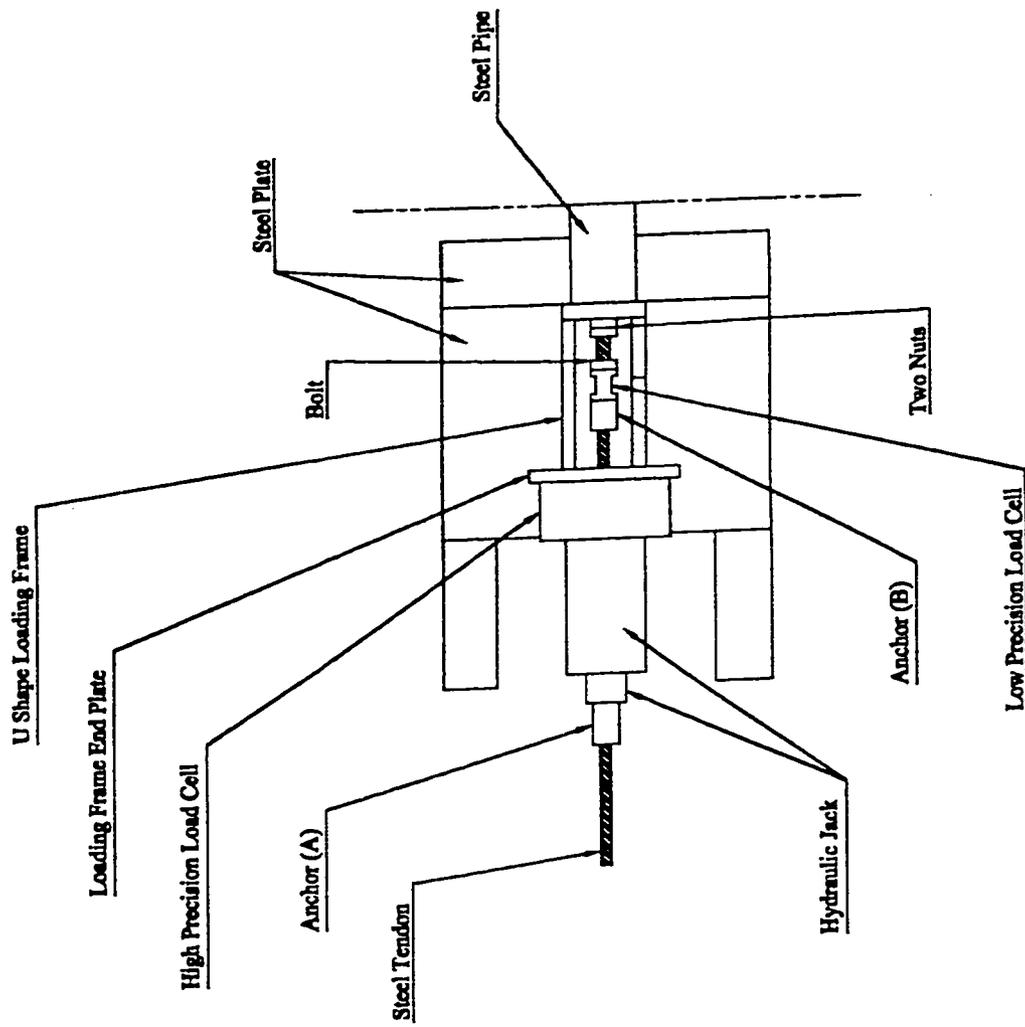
Plan View of the Specimen Attached to the Loading Frame (Release Testing Method).
